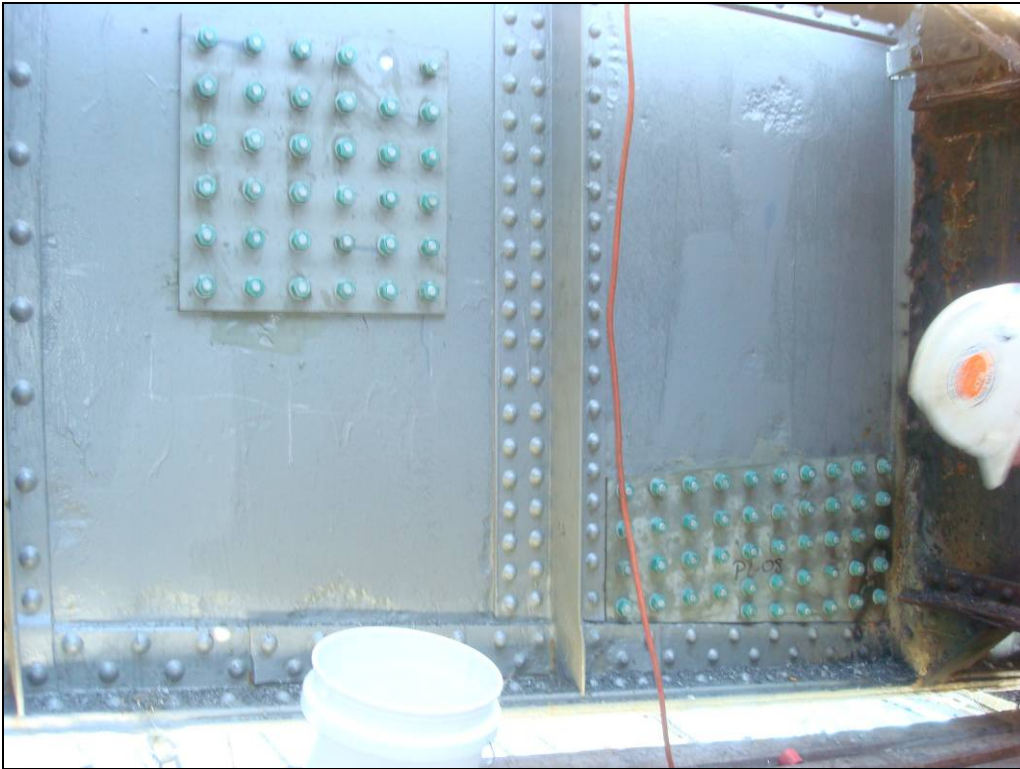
The Southeast girder repairs between the FB1 and FB2 in progress. The bolts still need to be tightened with an air impact wrench.
